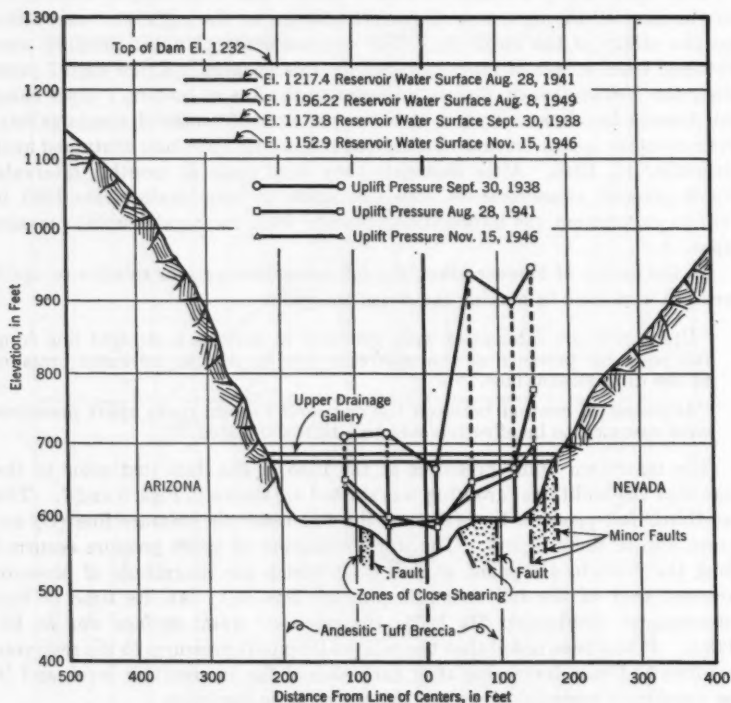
UPLIFT PRESSURE GRADIENT IN DEVELOPED SECTION ALONG CENTER LINE OF UPPER DRAINAGE GALLERY
